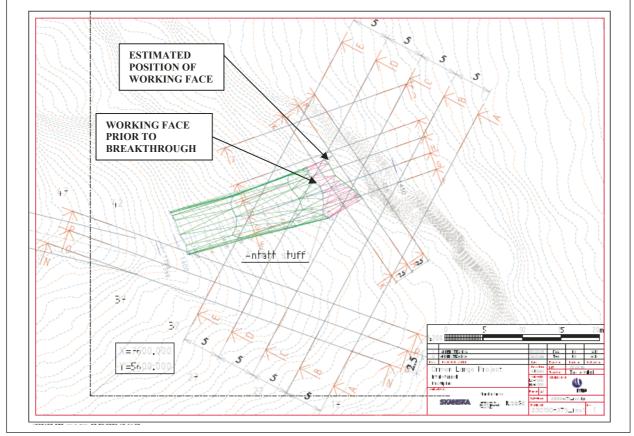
Working face measured in prior to firing the breakthrough round (green). Estimated position of working face after the breakthrough round (purple)
